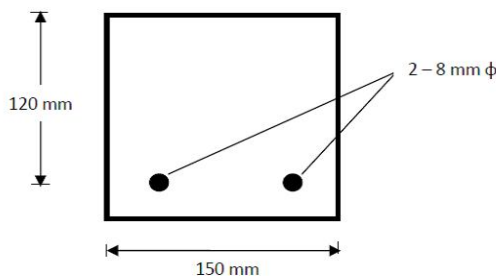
Cross-section of reinforced concrete beam without shear reinforcement (Series A)
